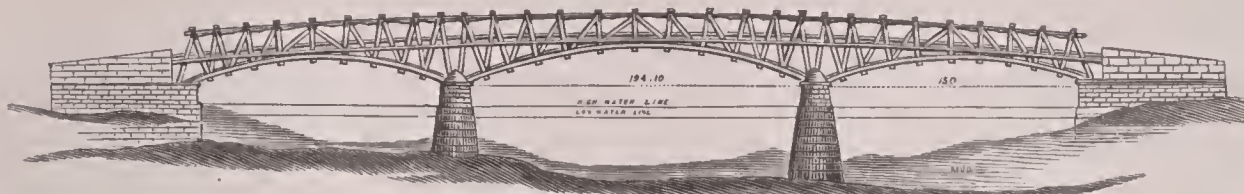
Palmer's bridge at Philadelphia, 1806.
